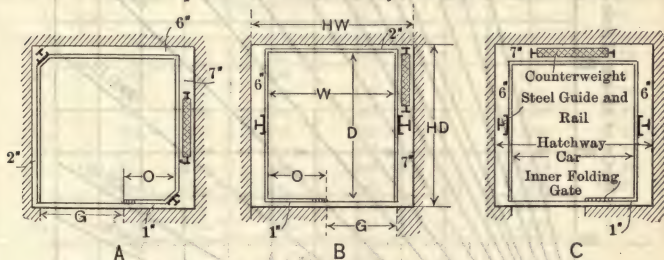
Typical Layouts for Elevator-hatchways and Car-platforms
